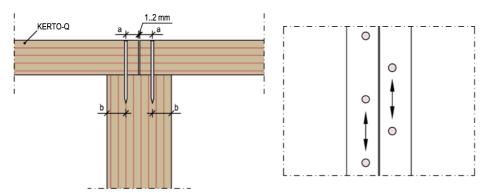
Panel joint on wooden construction, for minimum spacing see chapter 10.1.1.
